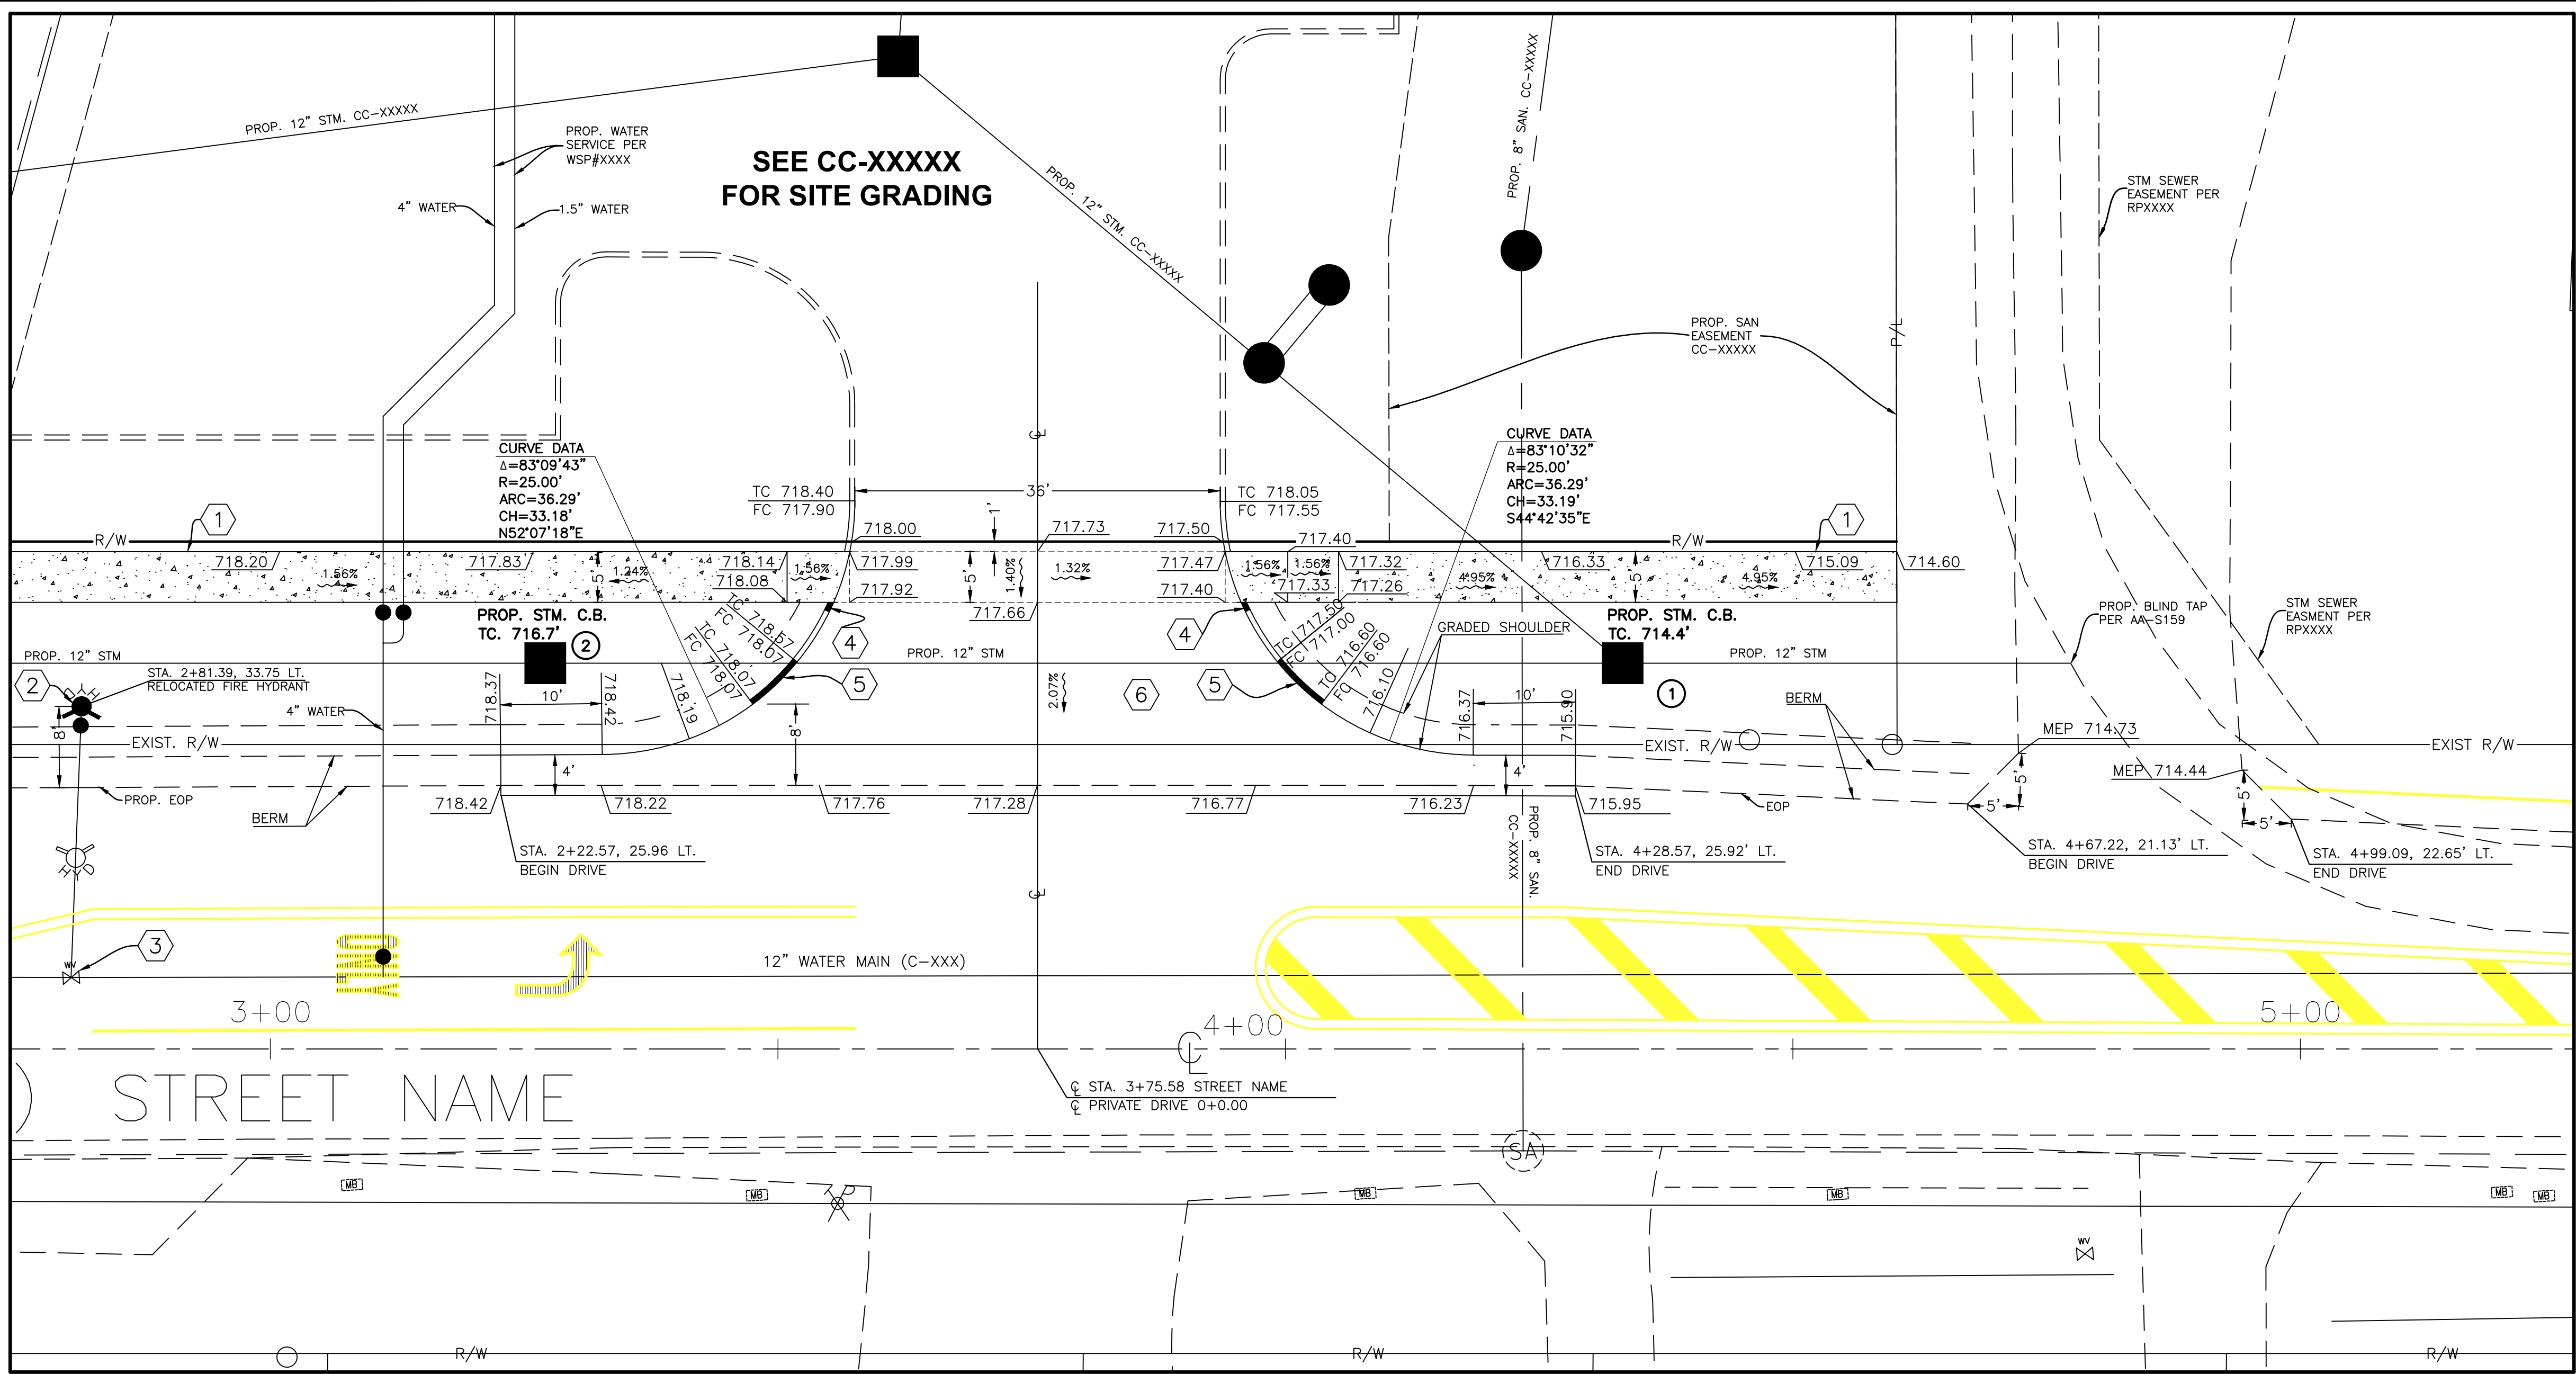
DETAIL - DRIVE STREET NAME 1 @ STATION 18+53.62
